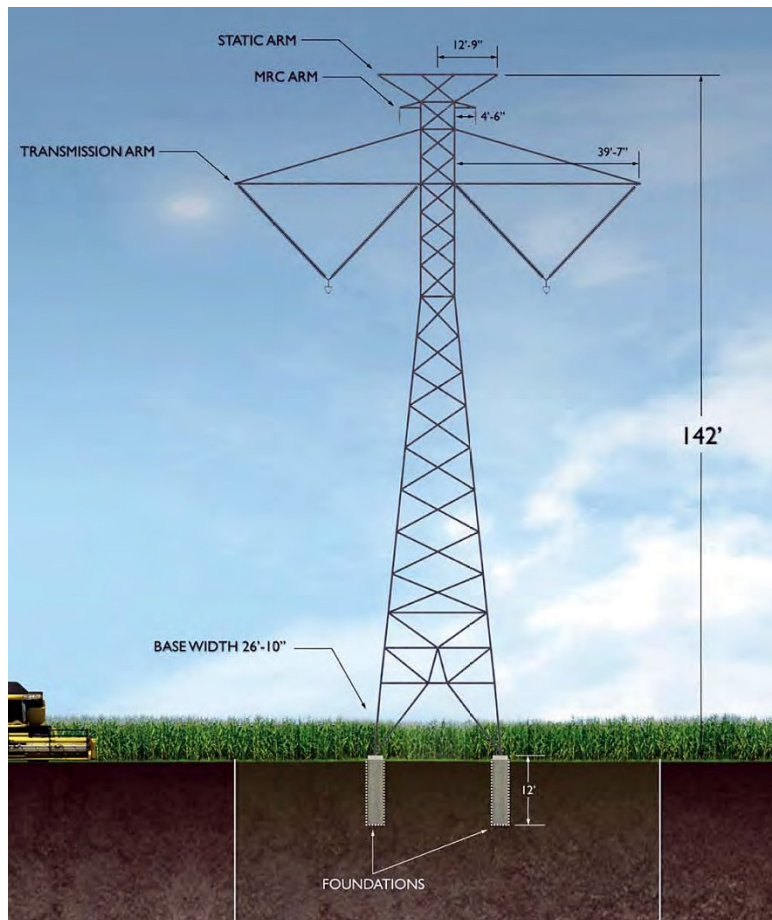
Typical overhead truss structure with a square base and four foundations, 142 ft height and 4-6 structures per mile.
